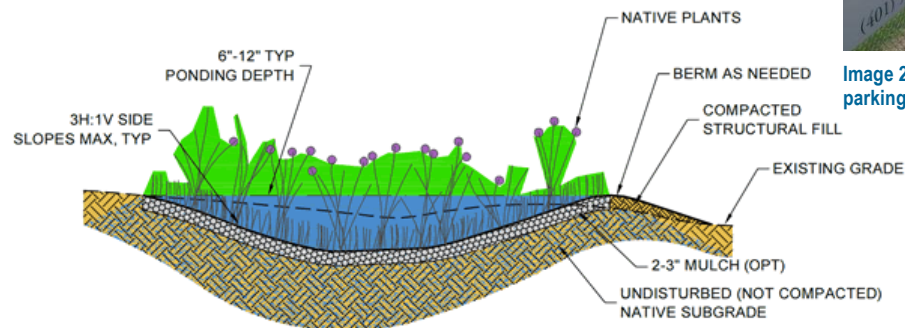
Cross-sectional view of a typical rain garden detail. (Image source: [http://www.5counties.org/docs/lu\\_planning/04\\_rain\\_garden.pdf](http://www.5counties.org/docs/lu_planning/04_rain_garden.pdf))
